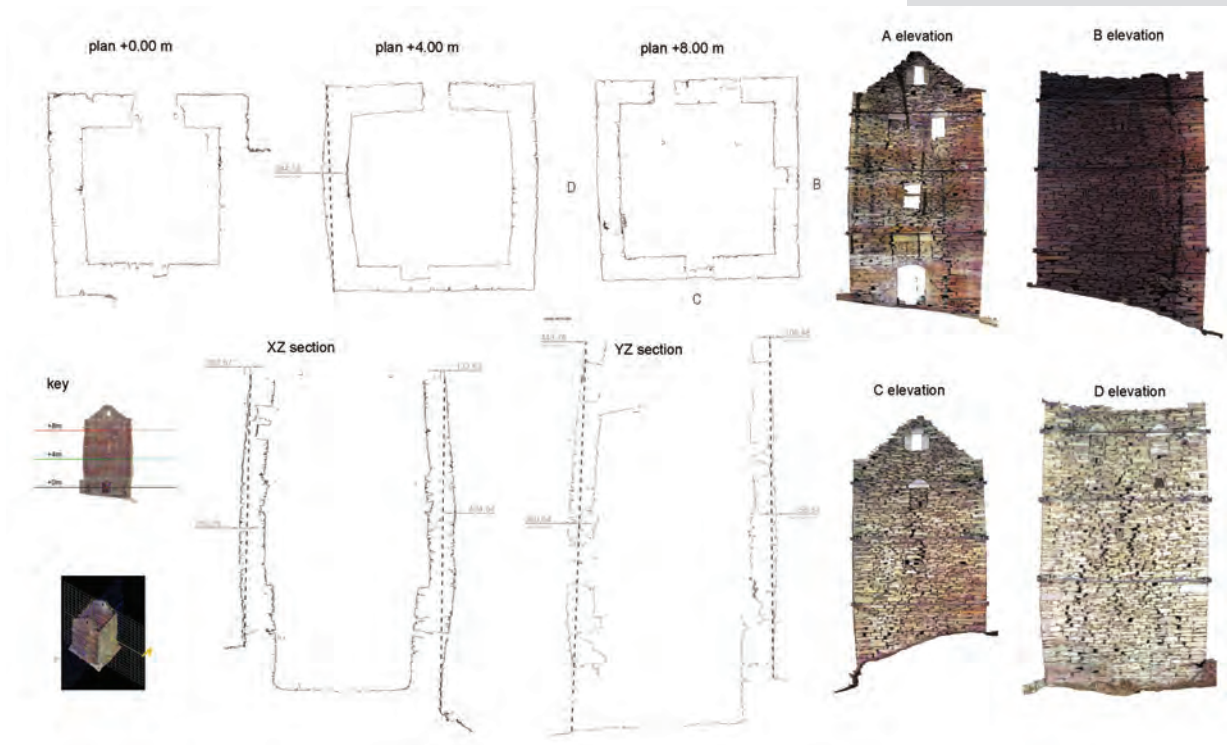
2D drawings obtained from the point cloud slices: plans, sections and elevations.
